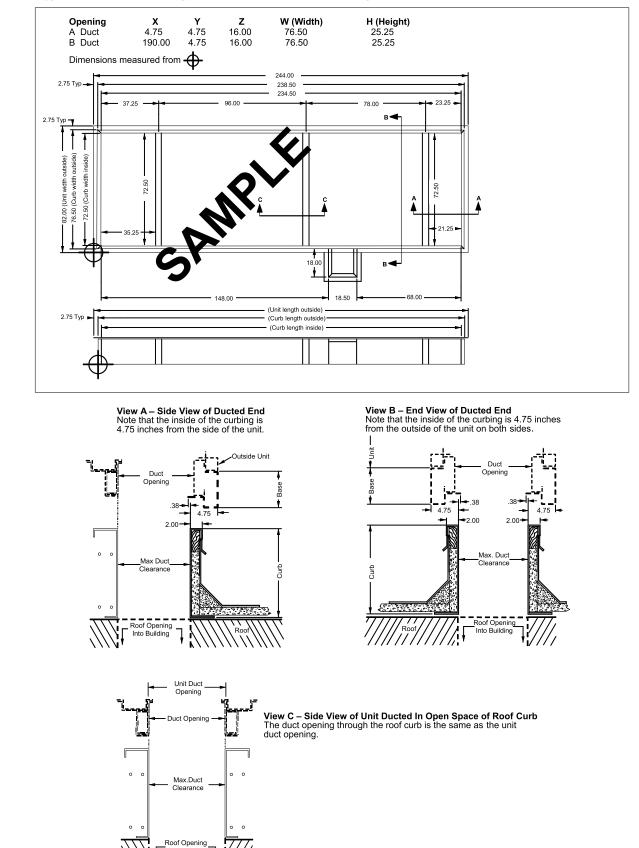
Typical Submittal Drawing and Air Duct Allowances through the Roof Curb
